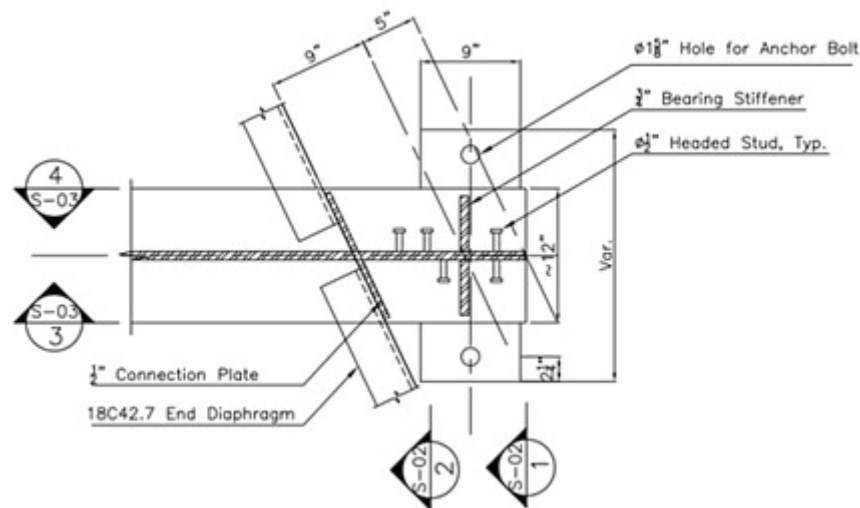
Sample plan view of stud layout for UHPC repair (Zaghi et al., 2017)
